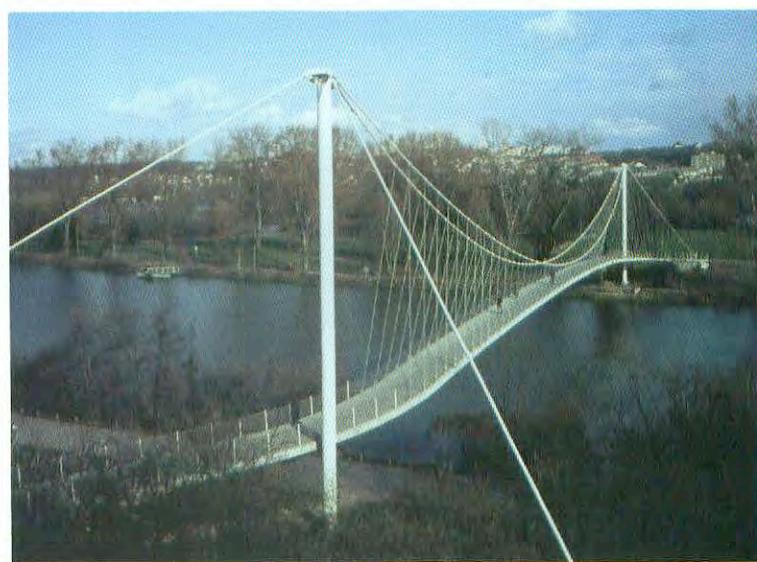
Max Eyth See Bridge – Stuttgart, [11]
